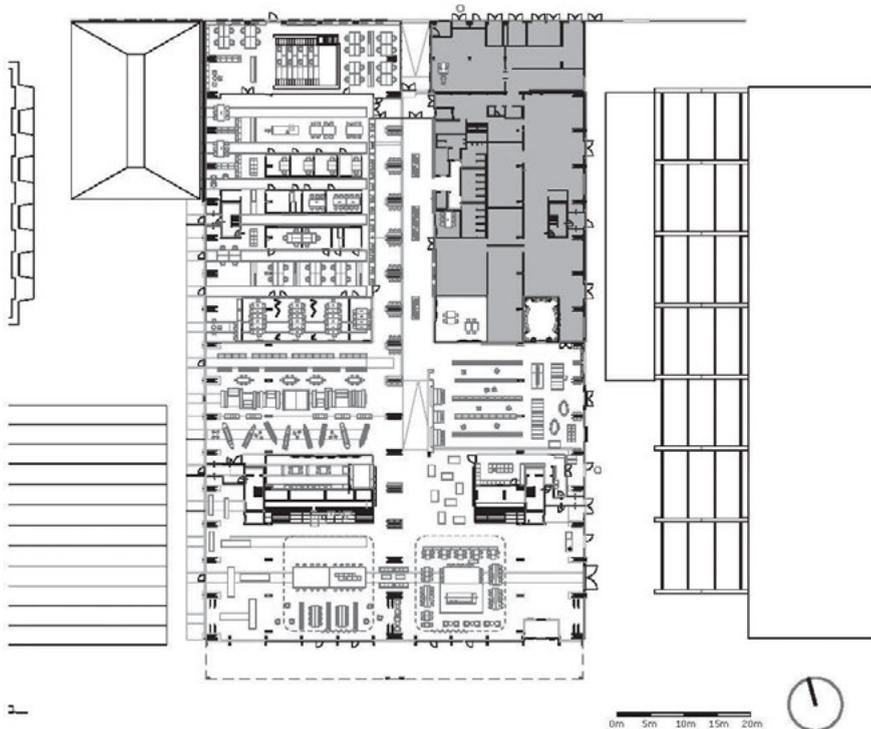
Ground floor plan. © Braaksma & Roos architects.
